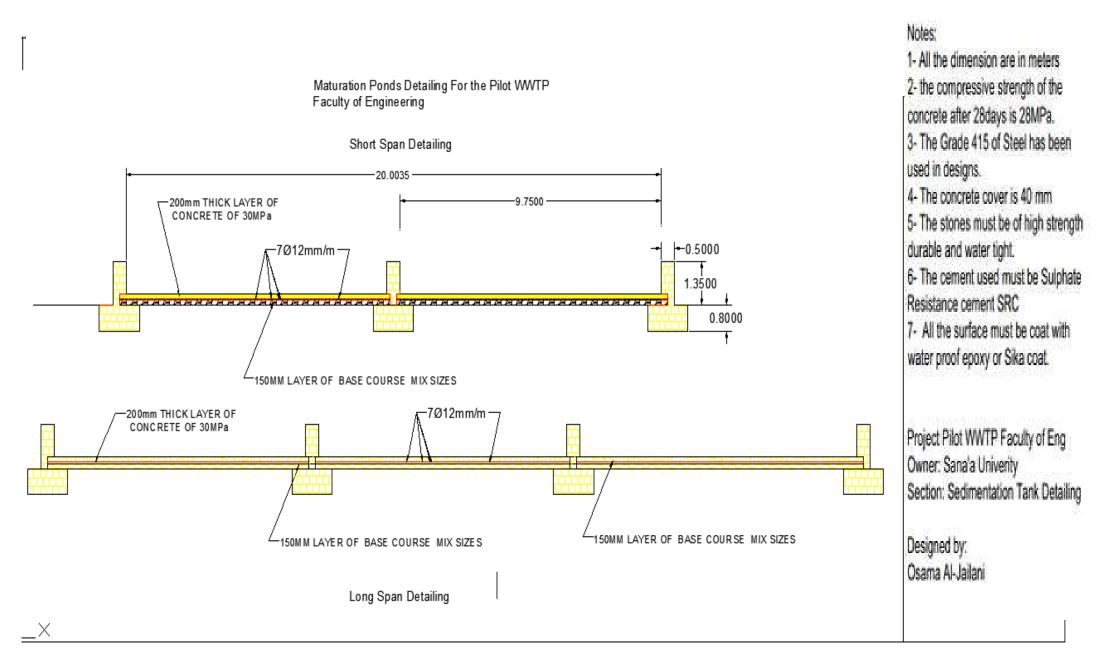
Reinforced Detailing of Maturation Ponds for the Proposed WWTP outside the Faculty of Engineering - Source Own Representative
